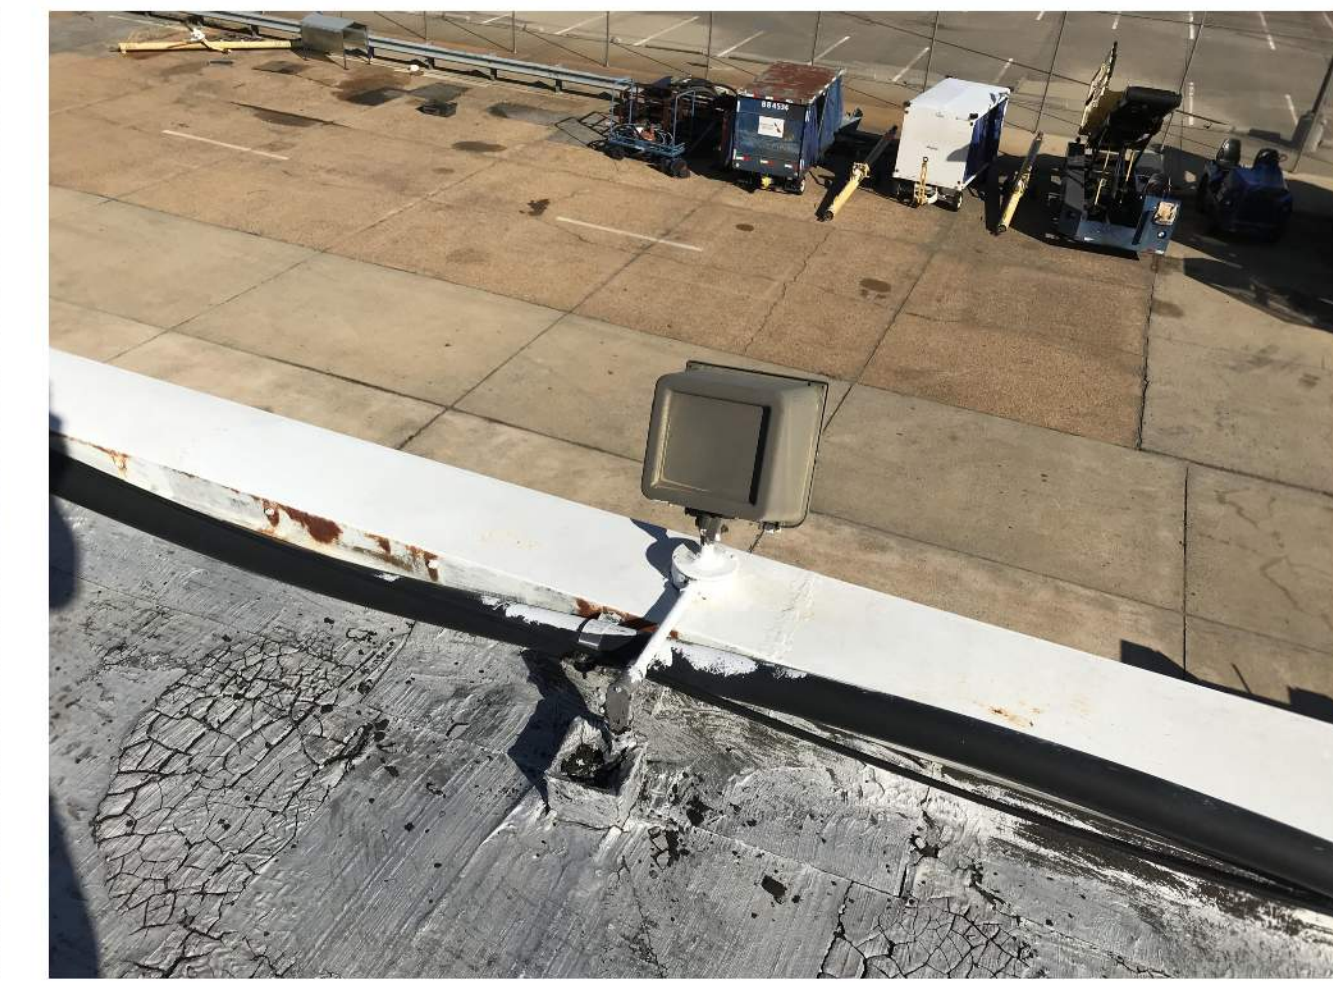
EXISTING AREA LIGHT SHALL BE REMOVED FOR REEROOFING AND REINSTALLED AFTER THE ROOFING IS COMPLETE. COORDINATE WITH AIRPORT AUTHORITY FOR ANY ELECTRICAL REPAIR WORK THAT MAY BE PERFORMED AT THE SAME TIME DURING OR BEFORE REEROOF
